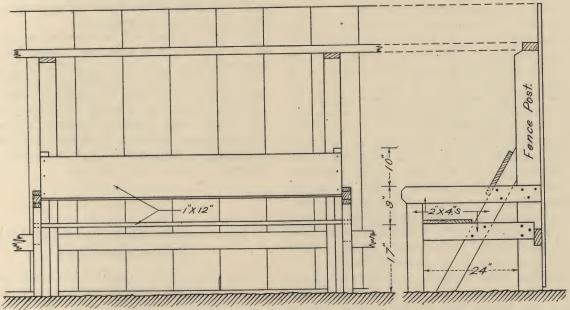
Front and End Views of the Seat Made by "Bliss"-Scale 1/2 In. to the Foot
